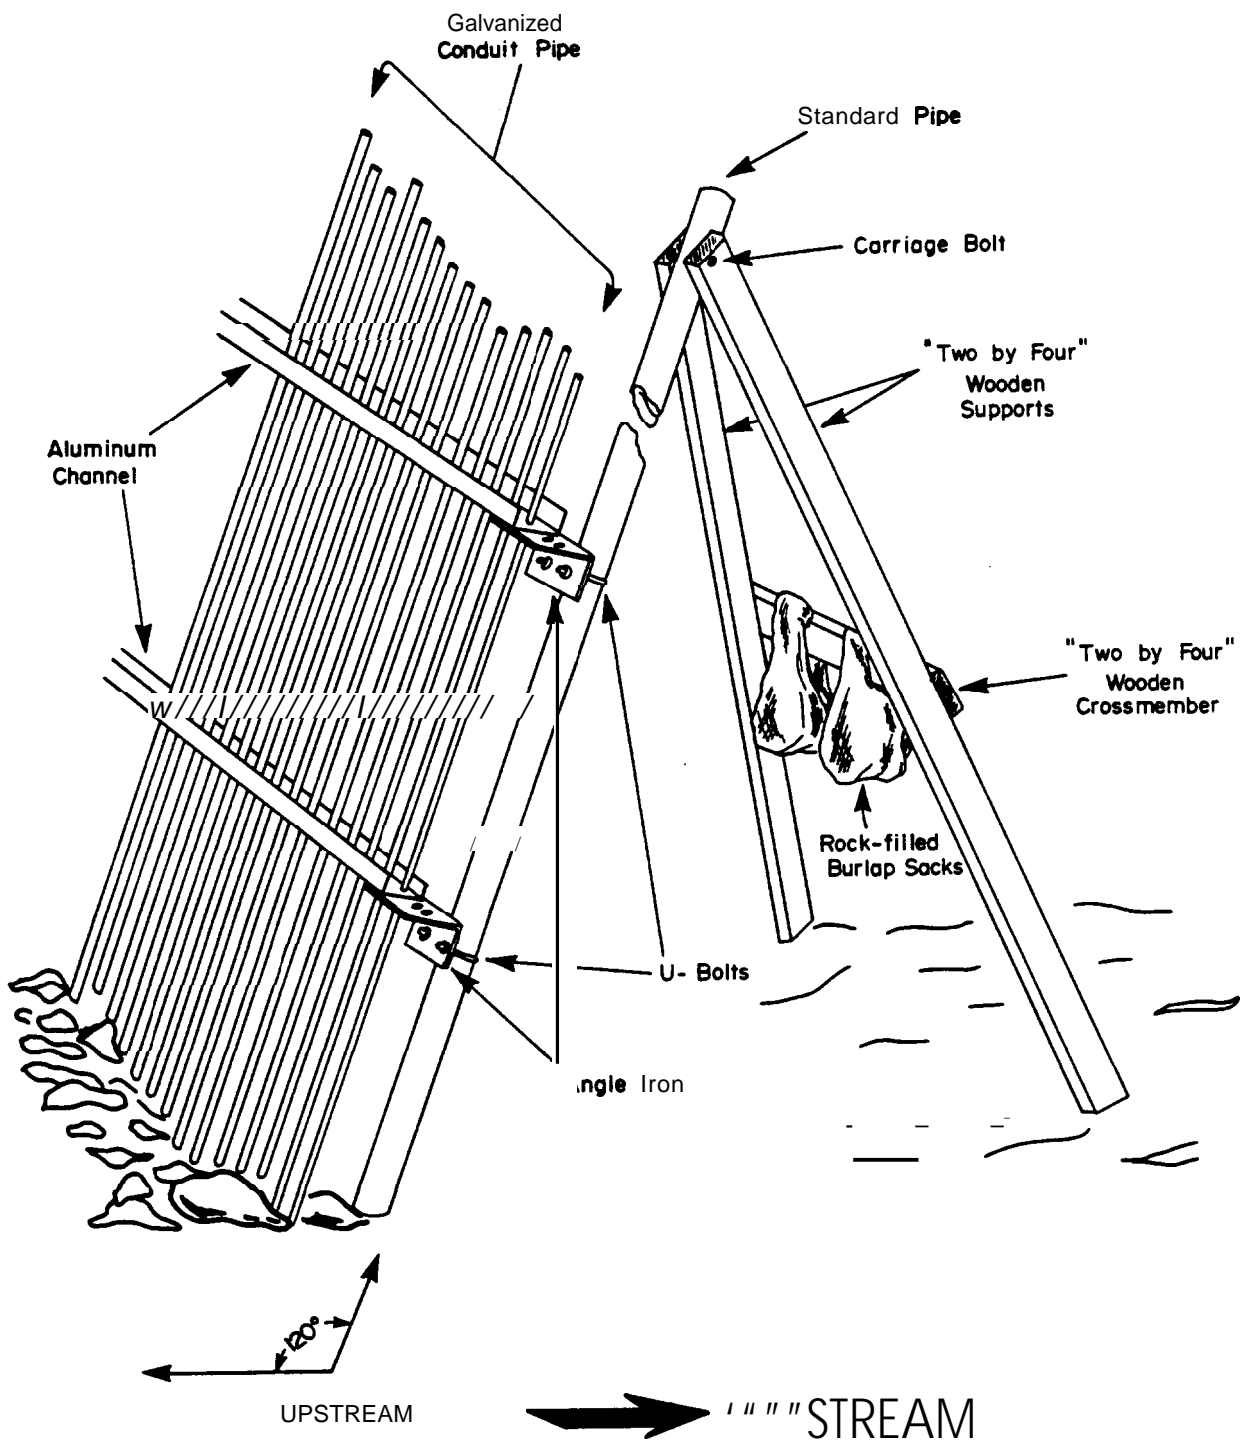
Construction details of wings of conduit pipe weir used in 1981-83.
